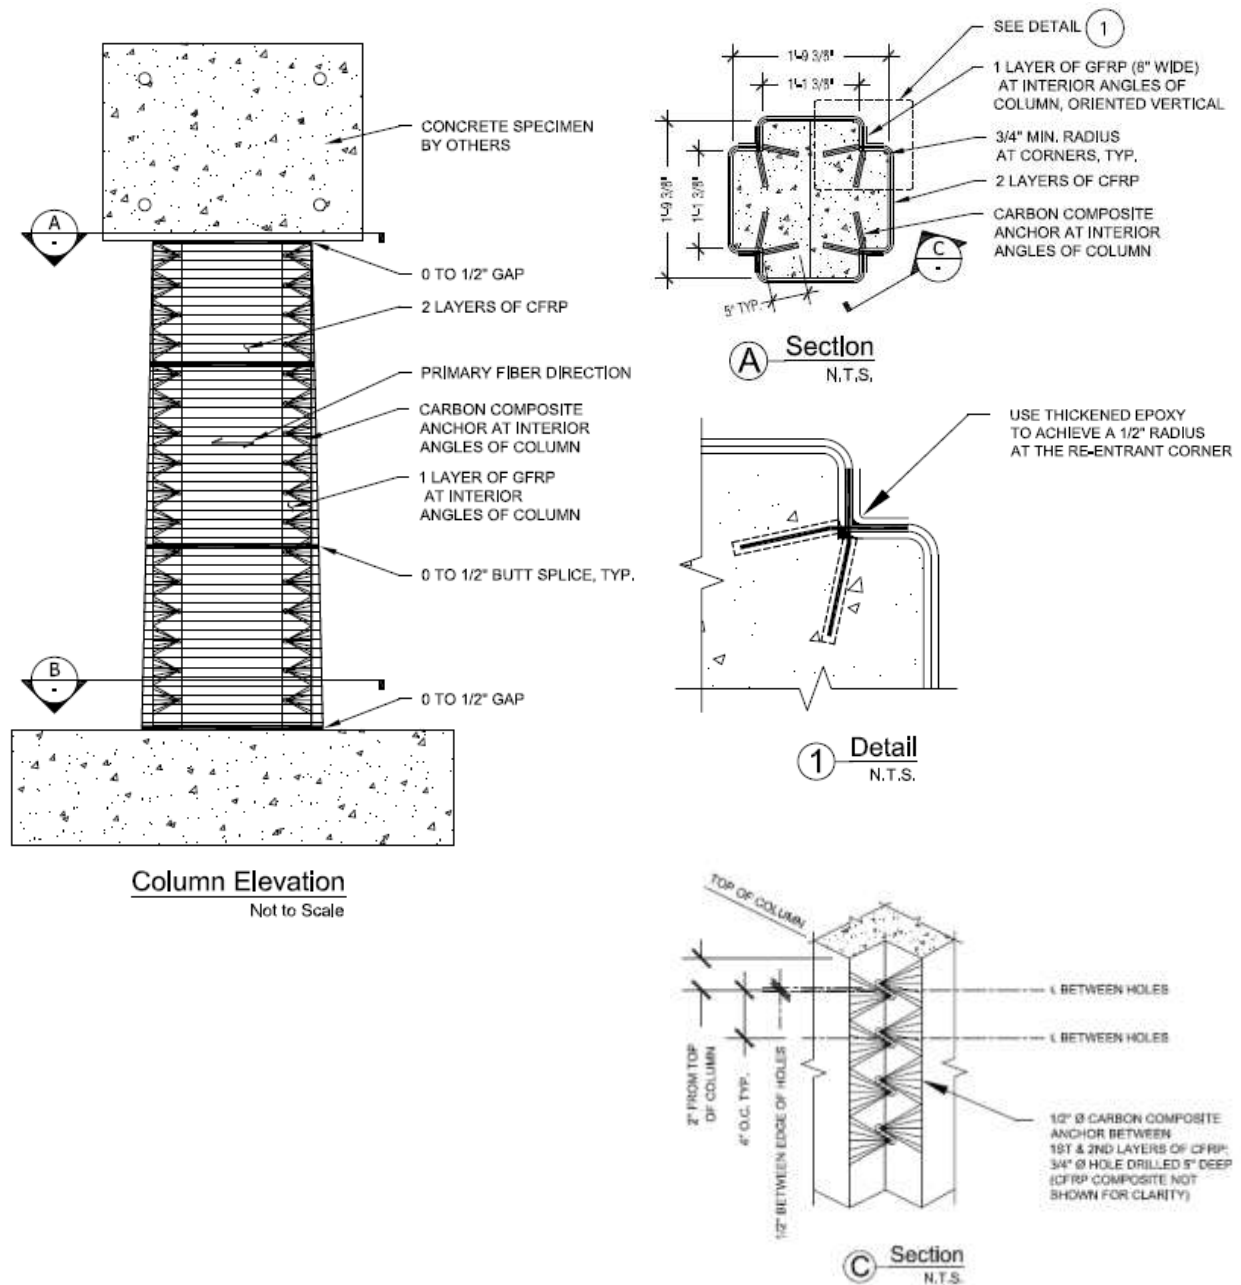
FRP Anchor Retrofit Details (1 in. = 25.4 mm)
